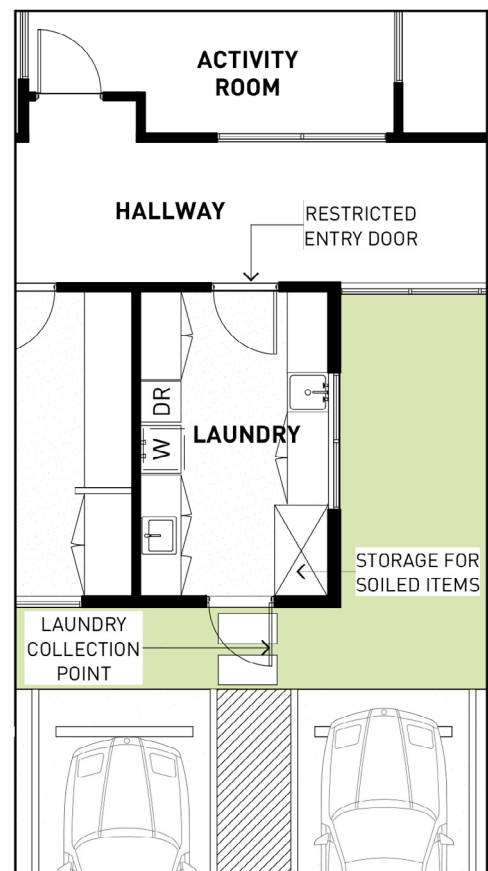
A typical child care facility laundry layout. External access may be provided if laundry is done off site or for deliveries.
